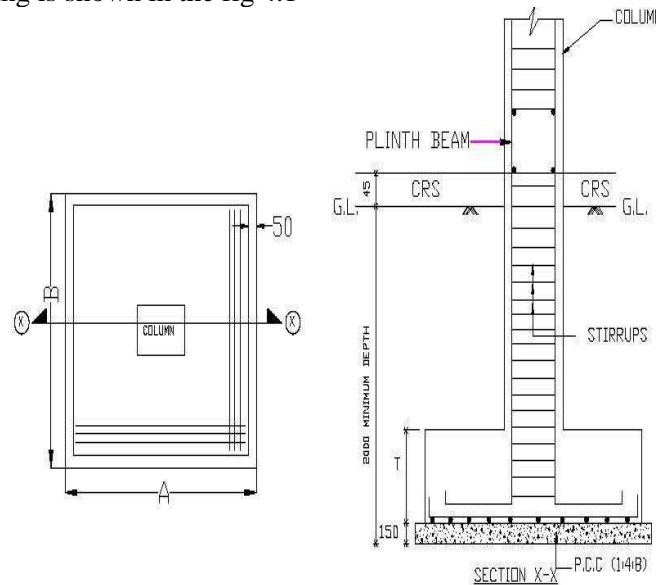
Typical Section of footing Let us consider footing F1 (1400X1400)
